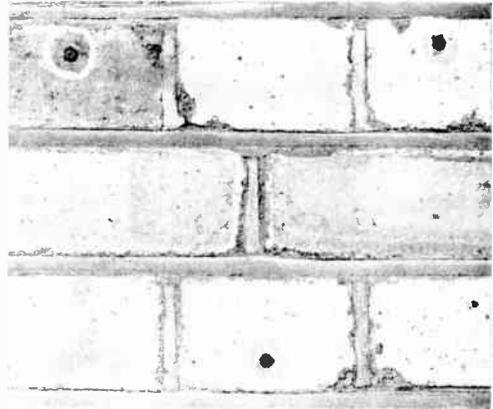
PLUGS INSERTED INTO A WALL READY FOR FIXING THE PROTECTED WALL LAMP SHOWN IN FIG. 6.
